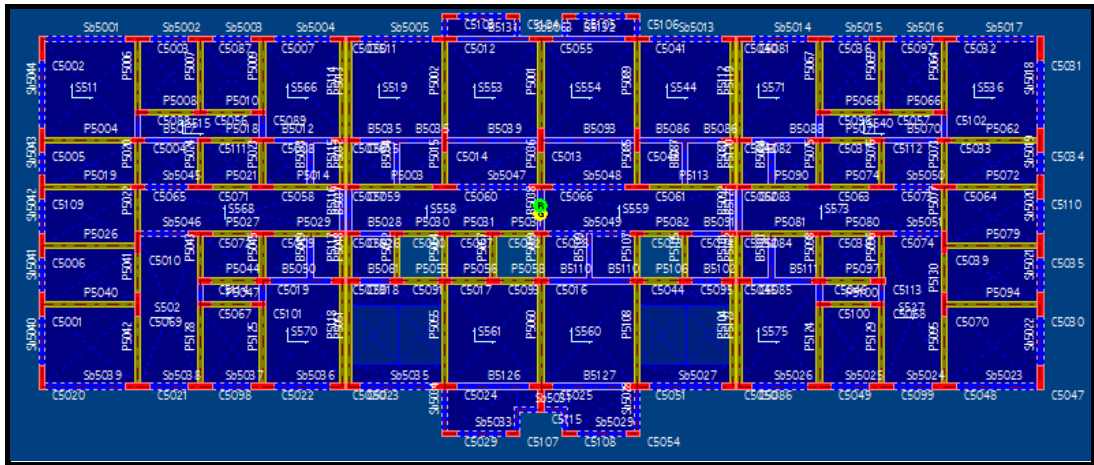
Plan of Buildings with Five Stories and Tunnel Formwork System
